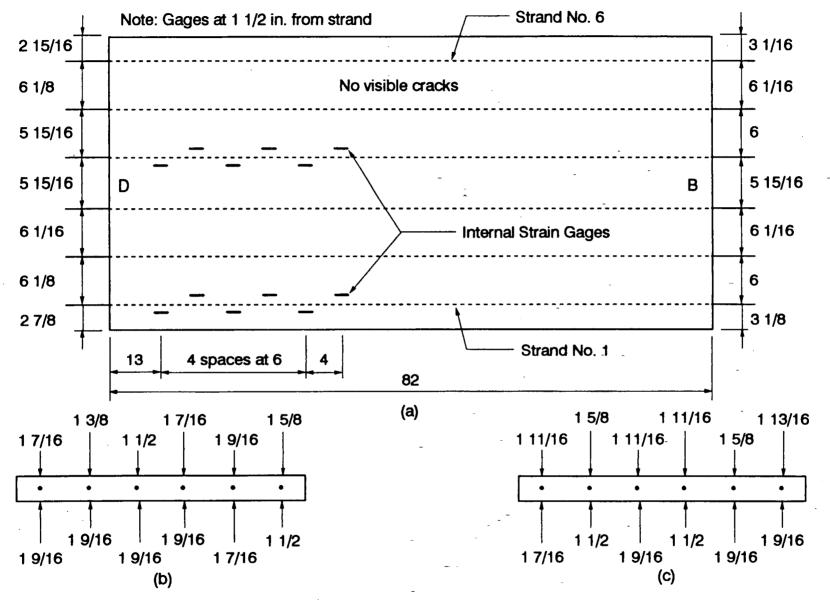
Specimen No. 15-3.0TU-2 (dimensions shown in inches): (a) plan view; (b) end view at D; (c) end view at B
